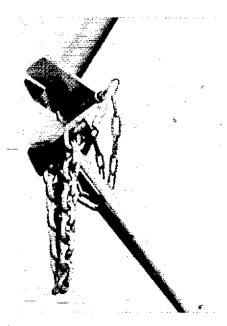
Bottom plate hinged unit. The groundstaking pin is at the lower center.
